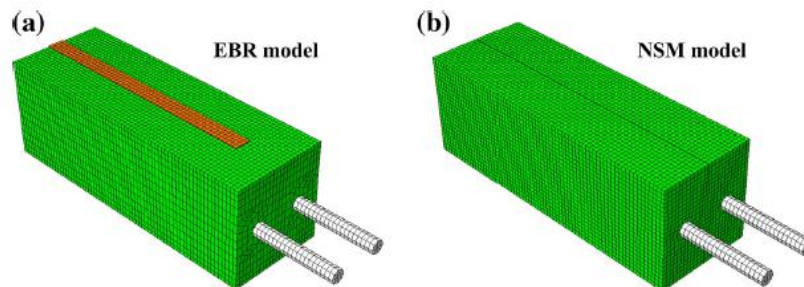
Arruda et al. (2016) [5] 3D numerical model specimens where (a) EBR design and (b) NSM design.
